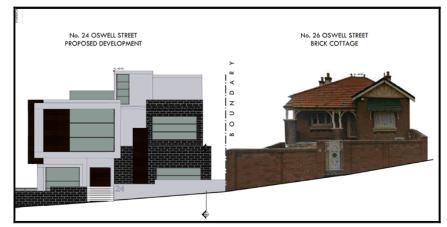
Oswell Street elevation illustrating consistent height along Oswell Street (Source: Space 0.681:1, November 2018)
